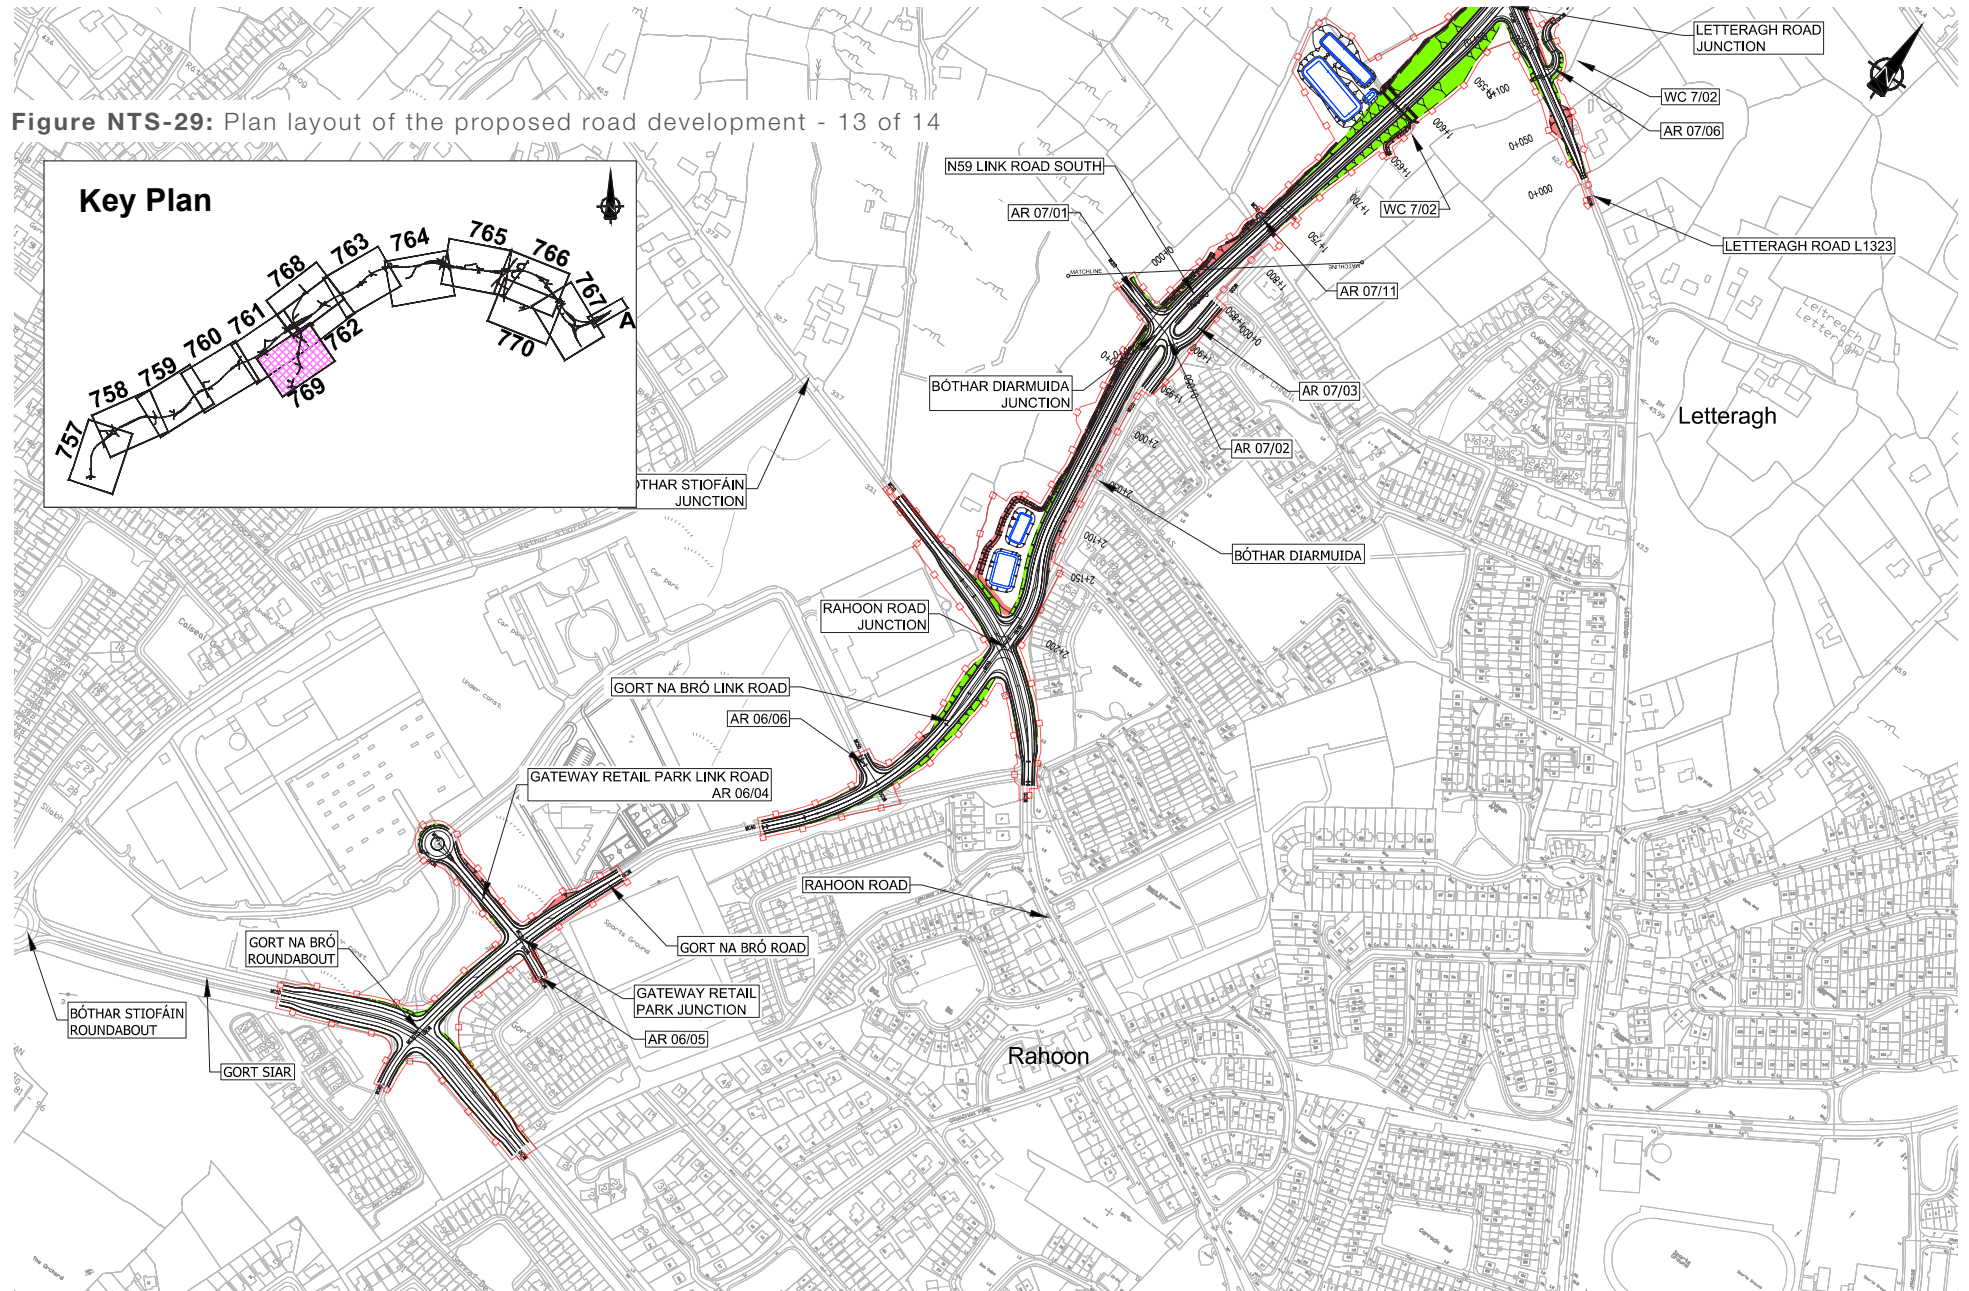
Plan layout of the proposed road development - 13 of 14
